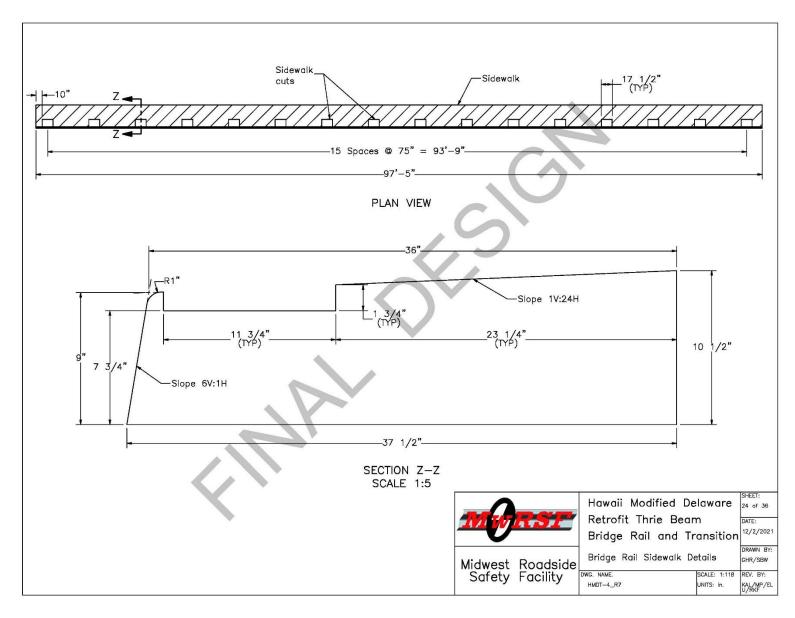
Bridge Rail Sidewalk Details, Test No. HMDT-4
